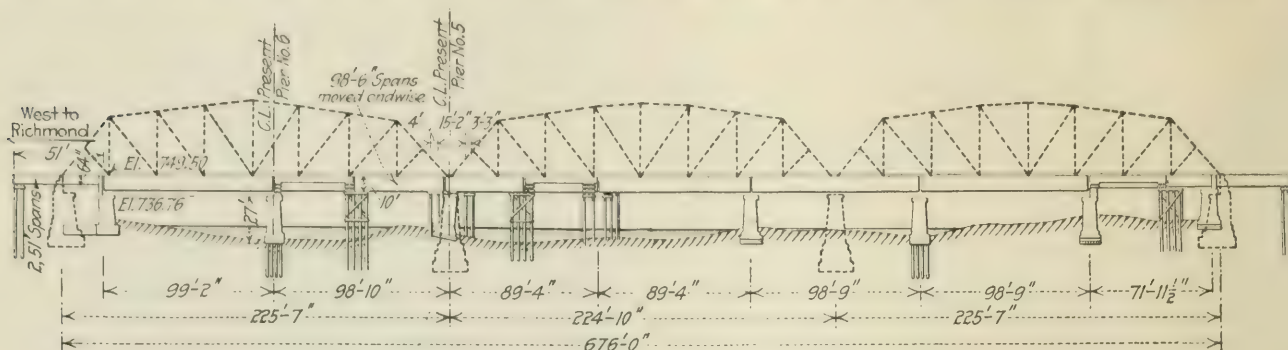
THE NEW DAYTON UNION R.R. BRIDGE AND ITS PIER AND SPAN CONDITIONS
